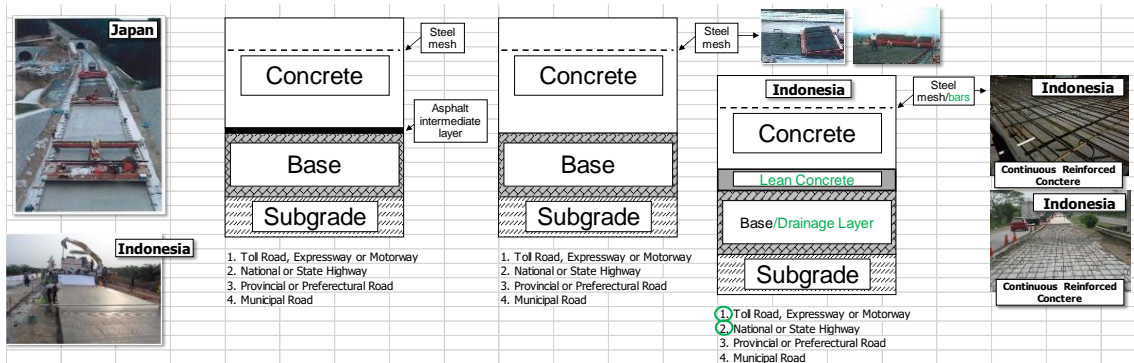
Concrete pavements, without asphalt intermediate layers but with steel mesh
